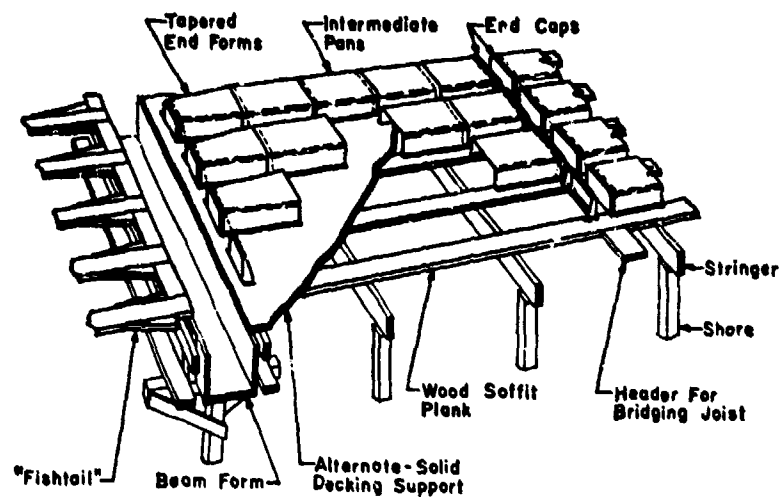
Example of form construction for one-way pan slab showing soffit plant and solid deck support (Courtesy of American Concrete Institute)
